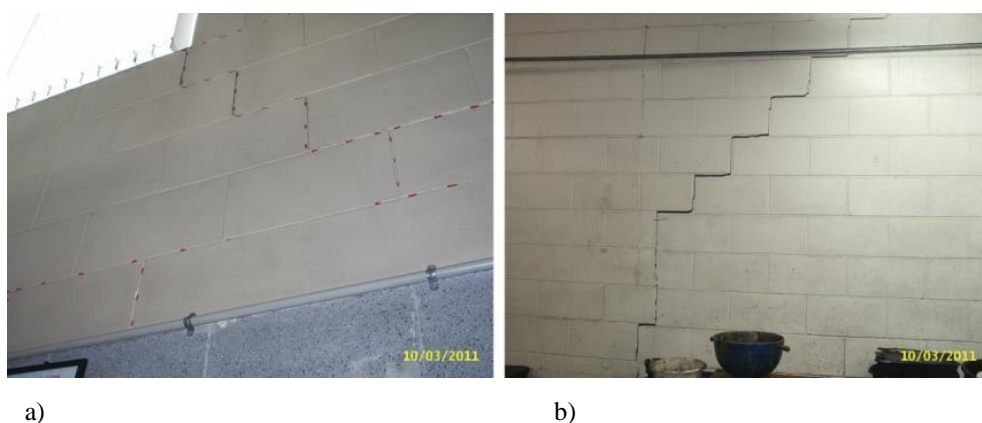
Observed damage on masonry infills after the 22nd February 2011 Christchurch earthquake: a) Diagonal crack, b) Short column
